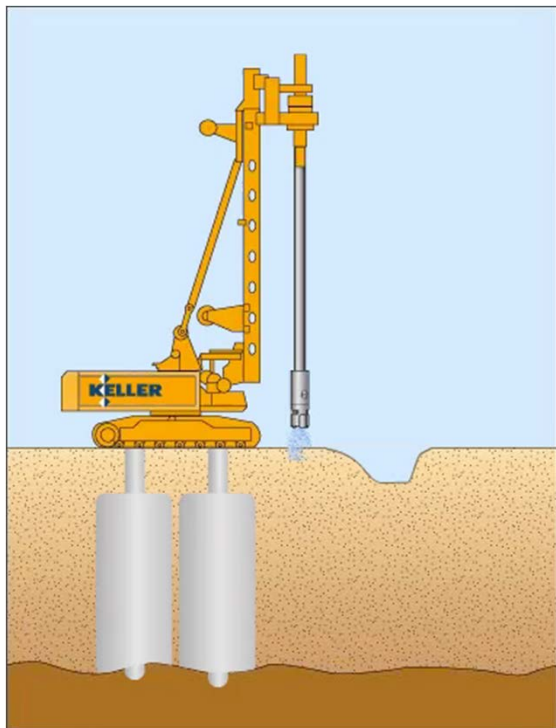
DSM secant pile wall and dewatering system. Teton County, WY (2020)
